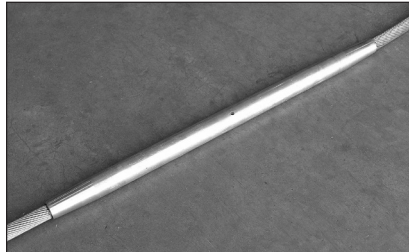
Slide the Aluminum sleeve over the installed Steel sleeve.
